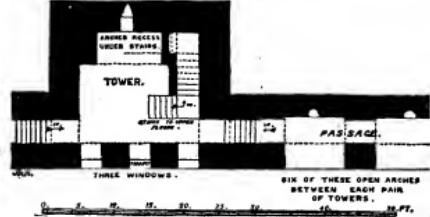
Aurelian's Wall: plan showing one of the towers and the passage in thickness of wall.
